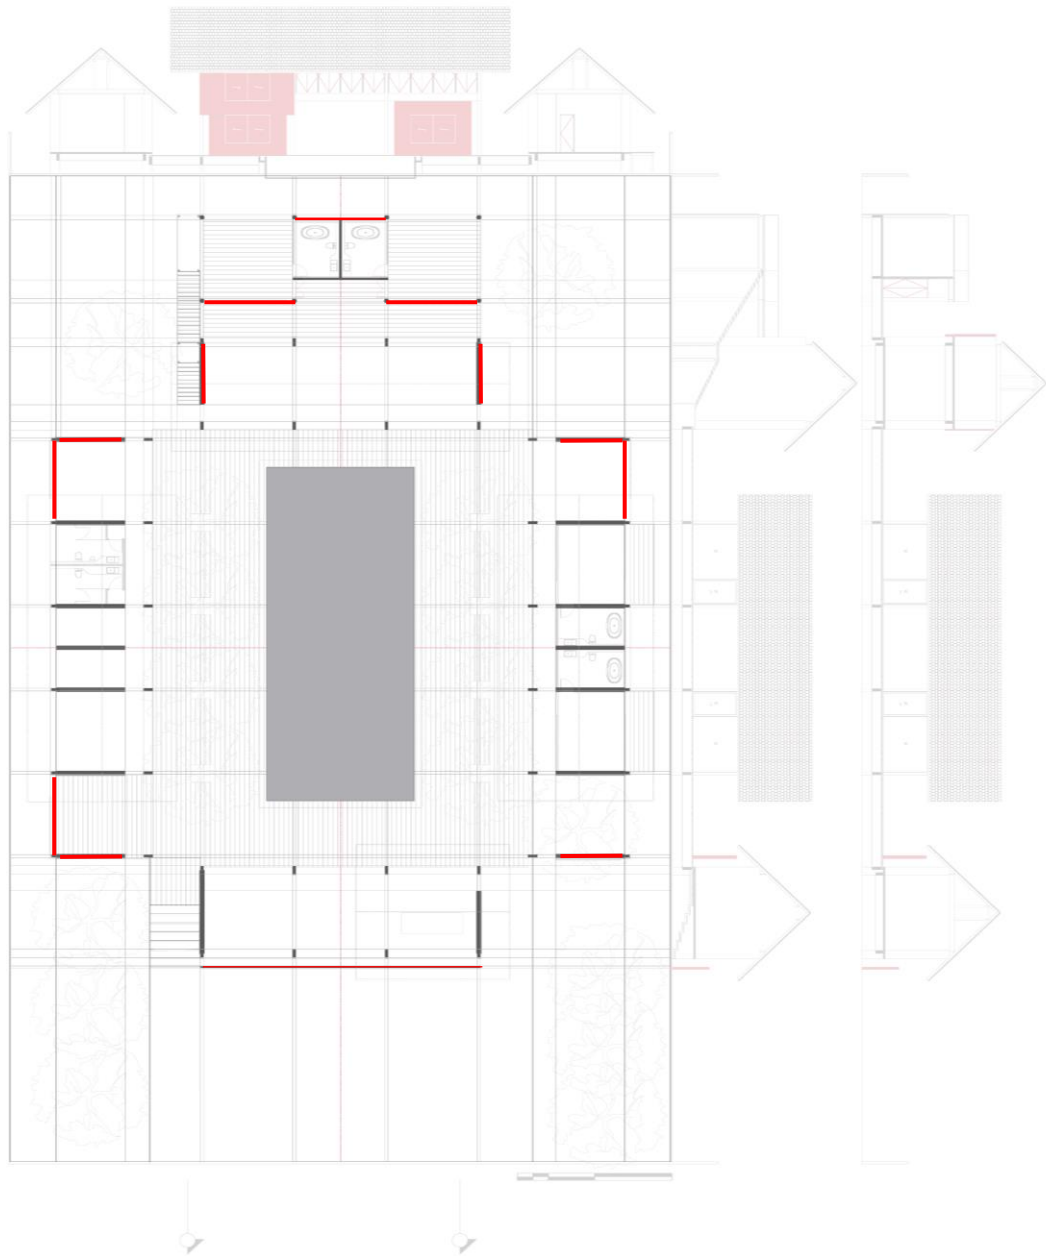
First floor plan framework over finished floor plan layer. Drawn by author.
